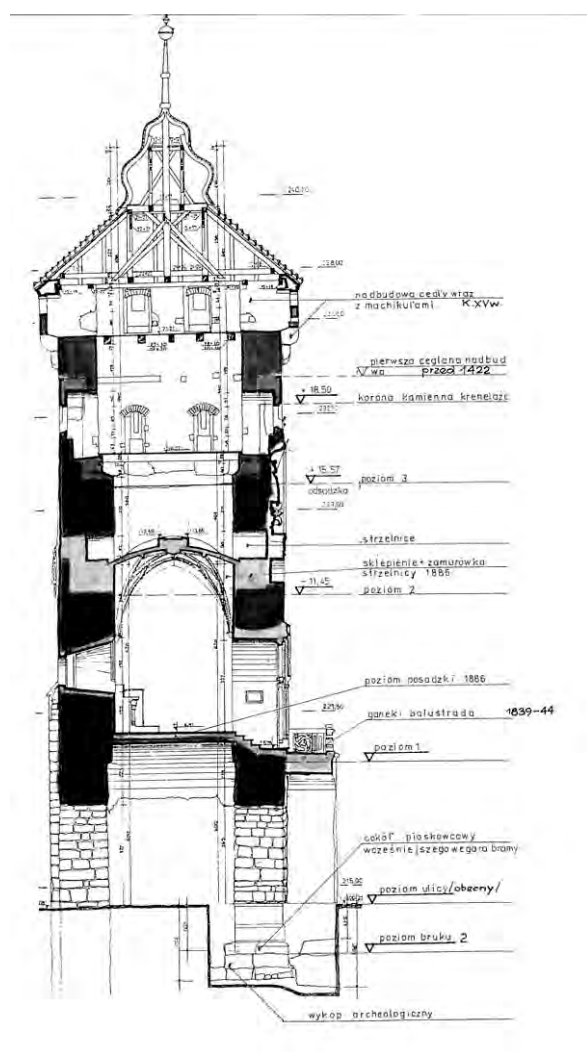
St. Florian's Gate, longitudinal profile, profile, wall stratification, compiled by W. Niewalda, H. Rojkowska, red color – stone wall, 13/14th century, violet color – 1390-1422 navy blue color – 1497-9, green color – 1882-6
